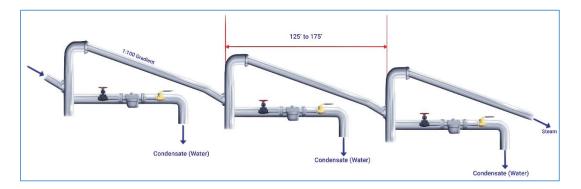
Proper Risers and Pipe Pitch to Prevent Water Hammer
